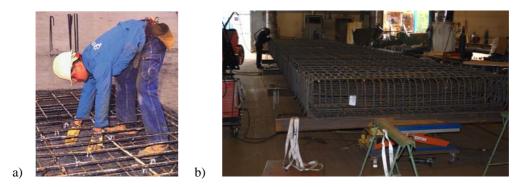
a) Traditional working position when placing reinforcement piece by piece. b) Steel reinforcement prefabricated in the factory and shipped to construction site.
